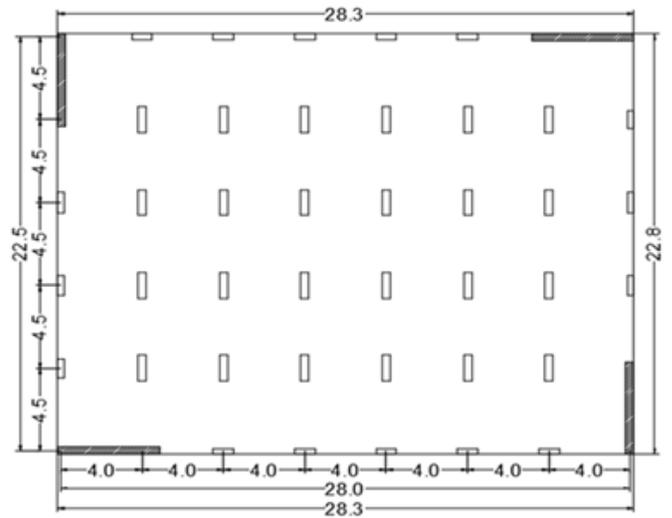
Model (5) Building with Shear Walls at exterior perimeter parallel to X-&Y- direction.
